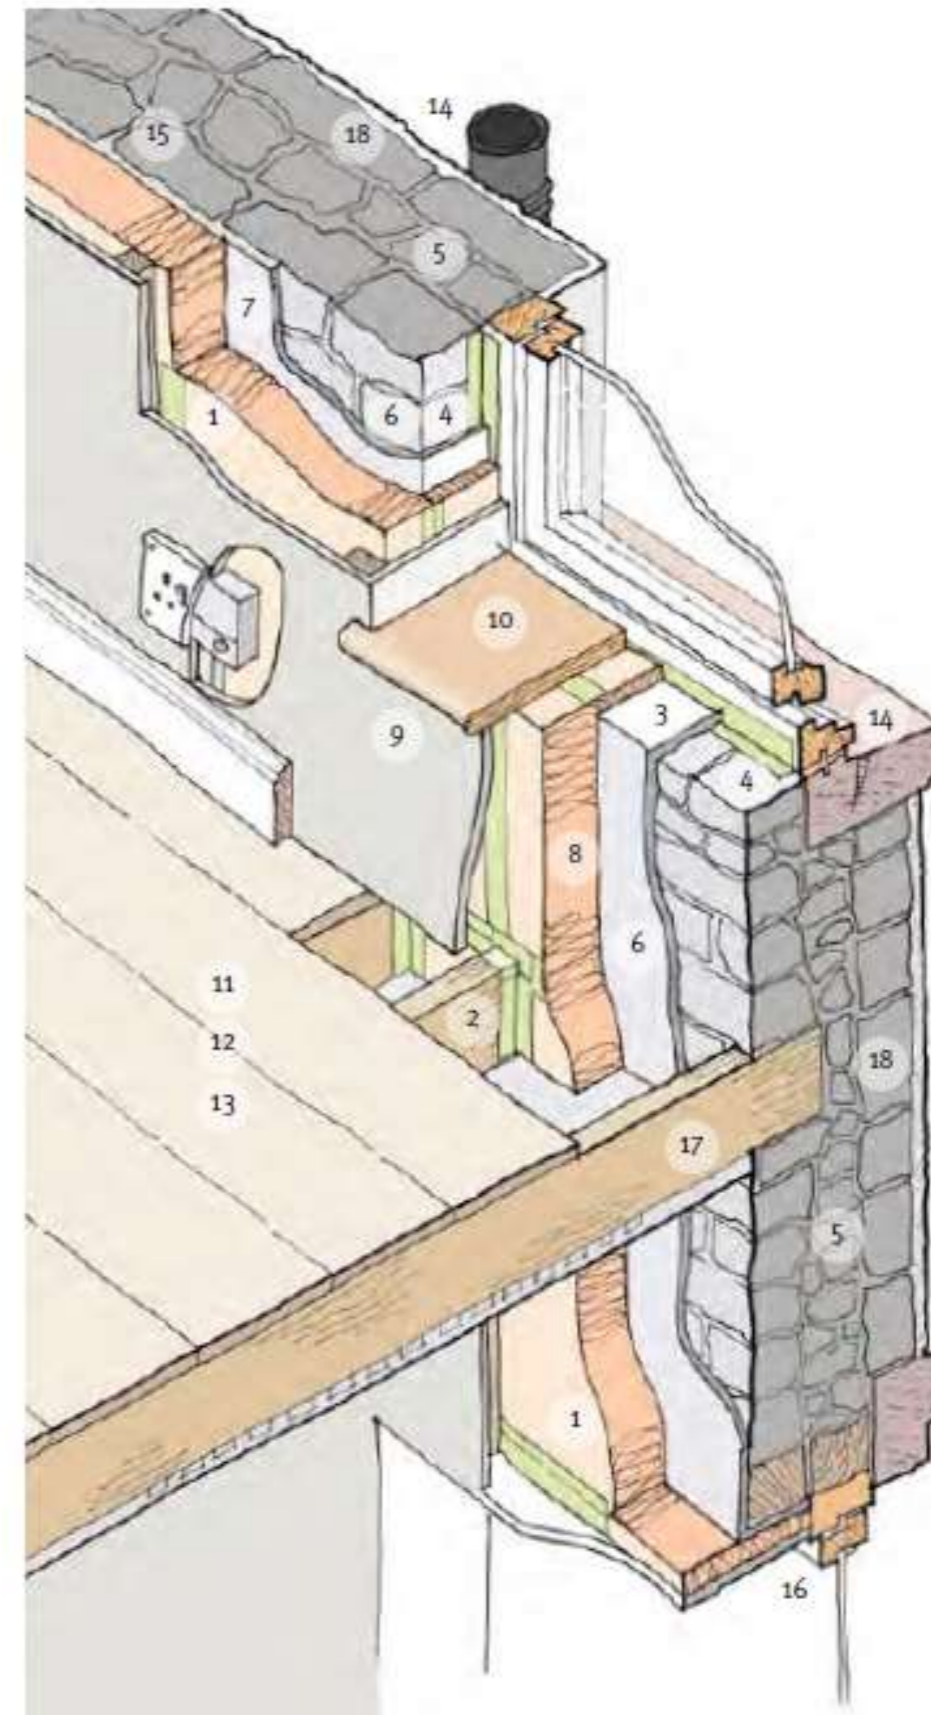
Internal Wall Insulation Method (Morgan, 2018)
